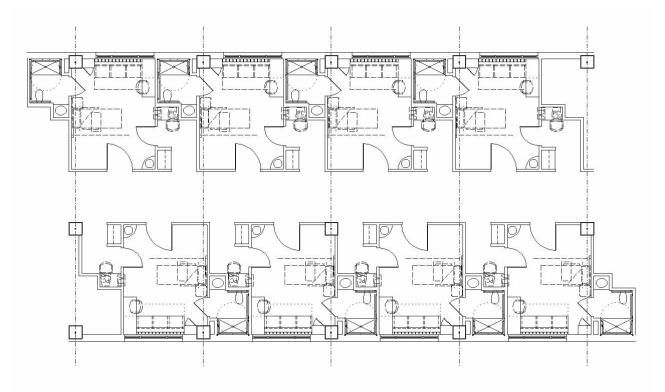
Floor Layout of Single-Patient Rooms in St. Joseph's Hospital
